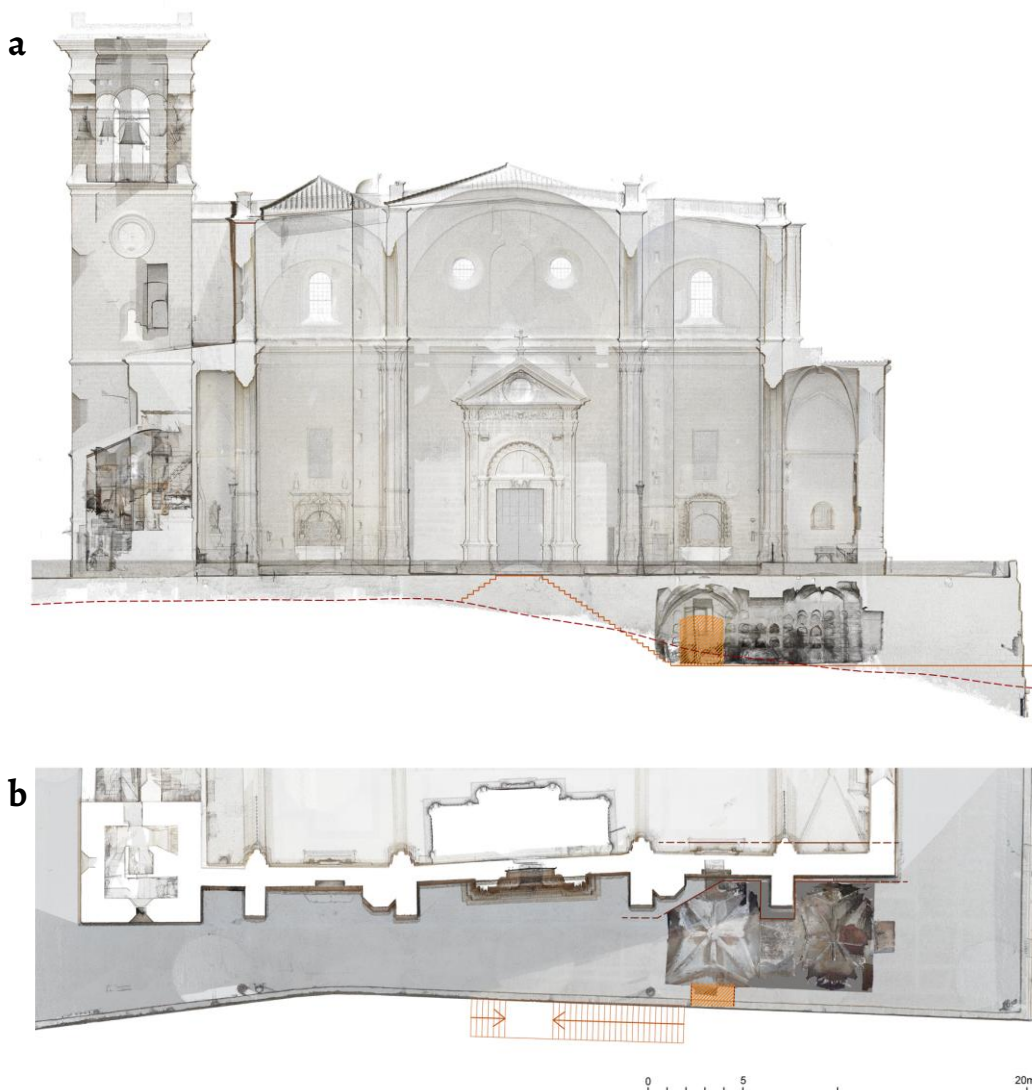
Facade with cryptoportico and possible stairway: a) floor plan; b) elevated plan.
